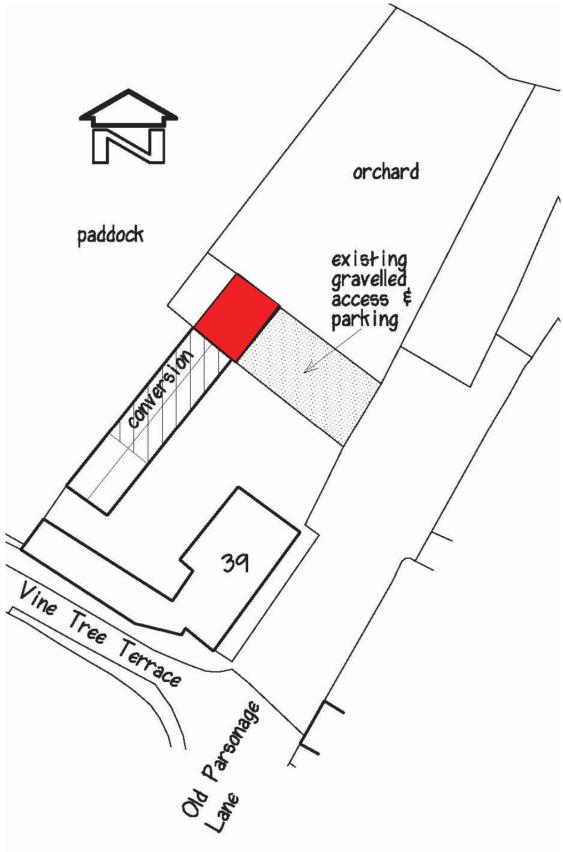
Proposed site layout Garage highlighted in red. Plan supplied by client
